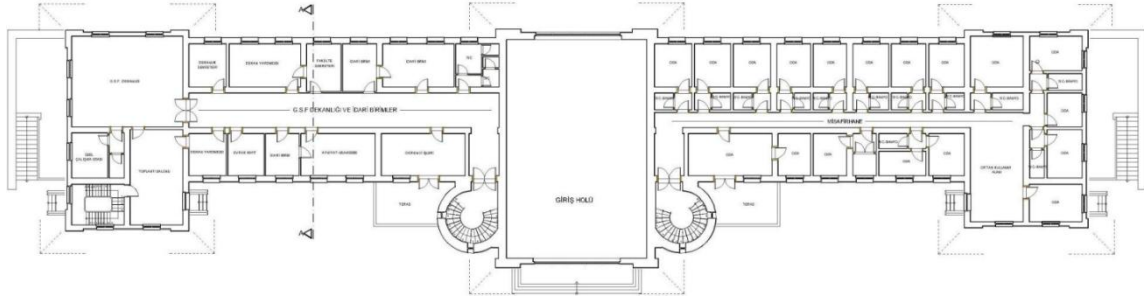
Measured Survey Project of the Edirne Train Station Building (Faculty of Fine Arts, Trakya University), First Floor Plan (Archive of the Department of Construction and Technical Works, Trakya University)
